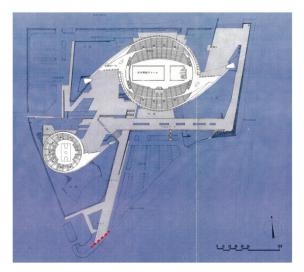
Site plan of Yoyogi Stadium 1964.10
